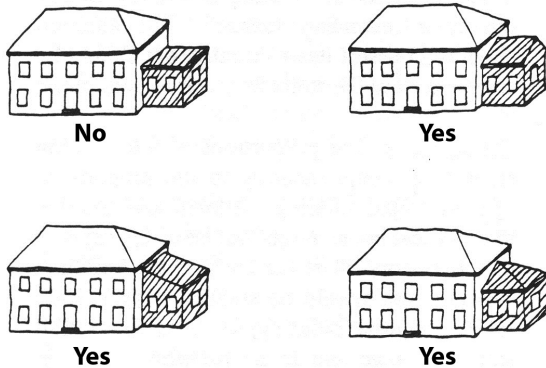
The roof shape of an addition should compliment the original building. Flat roofs are rarely acceptable.
